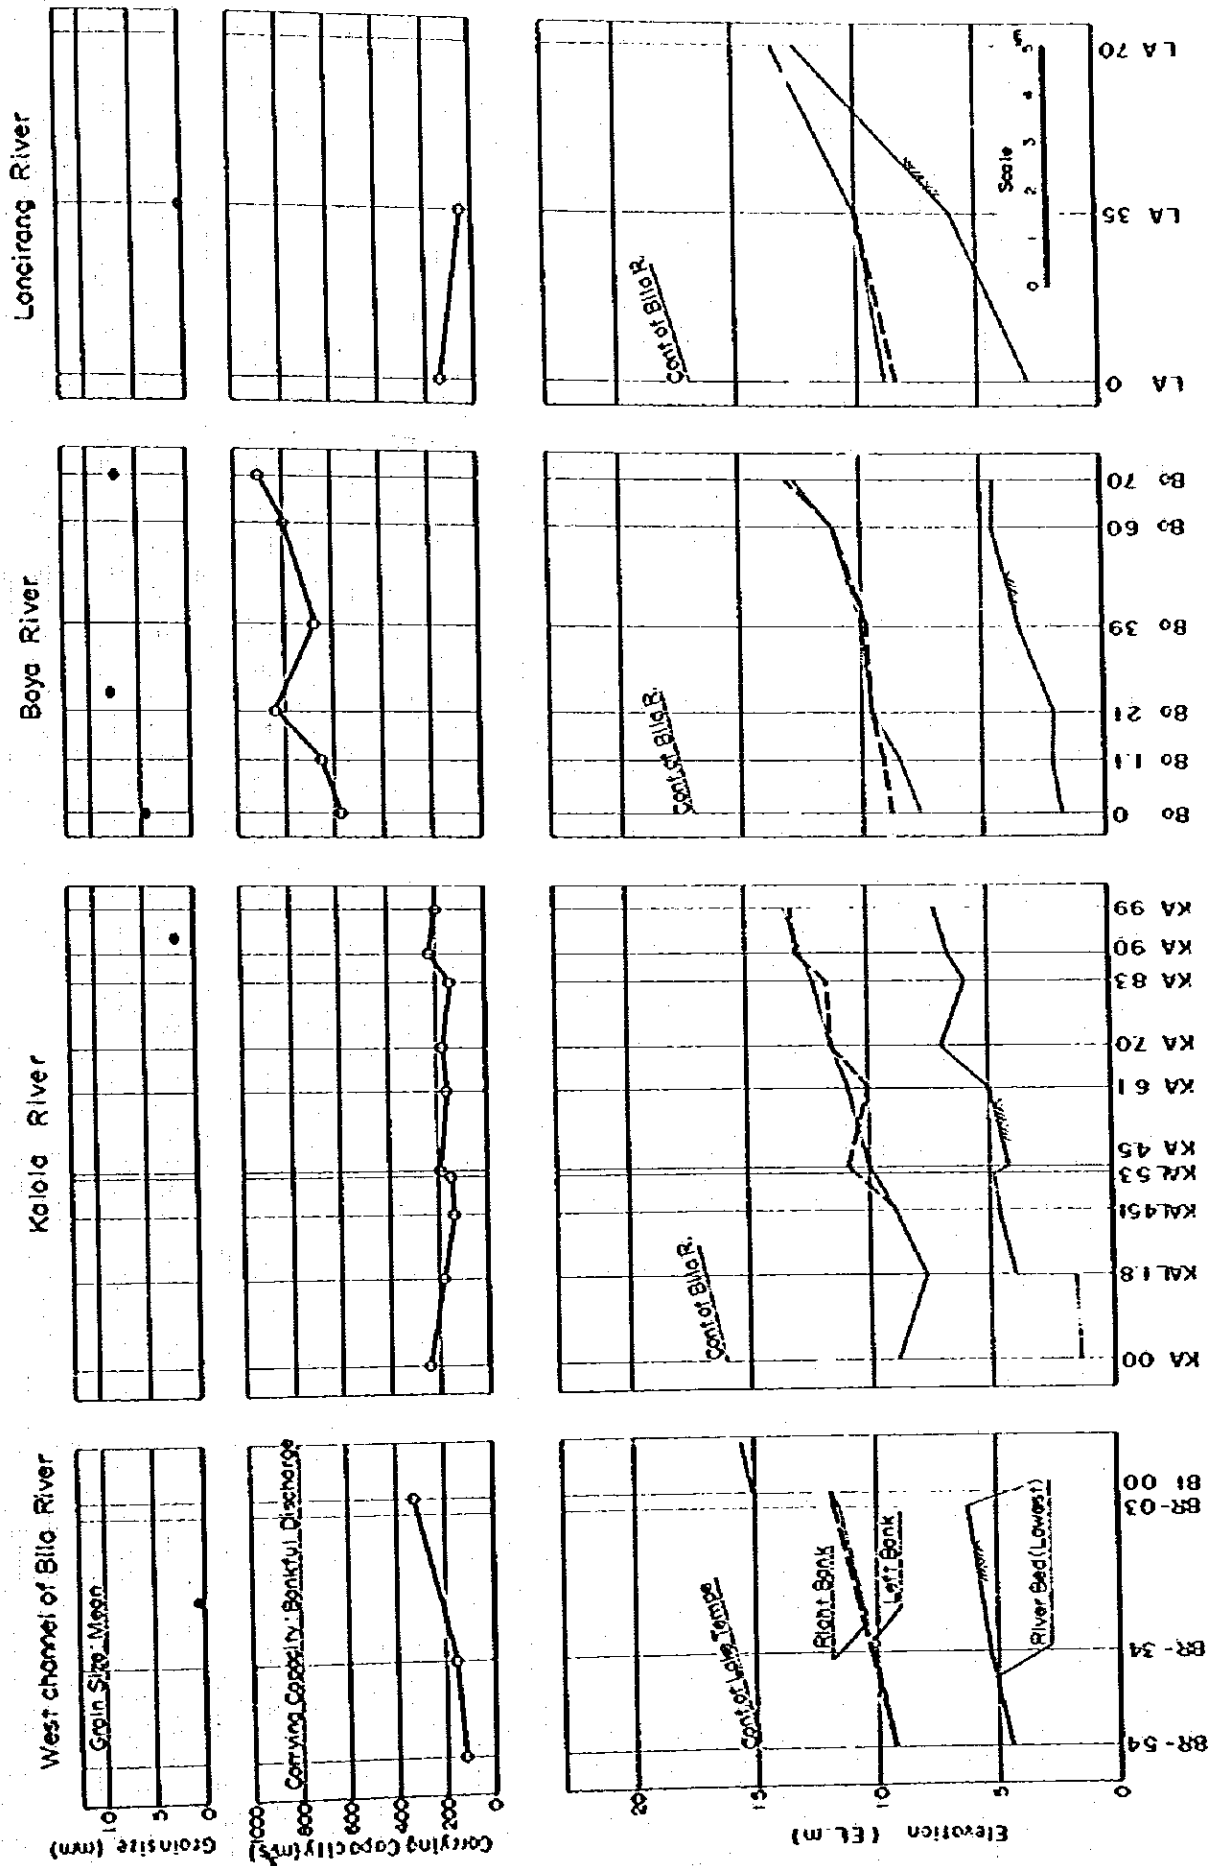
EXISTING LONGITUDINAL PROFILE (2/2)
